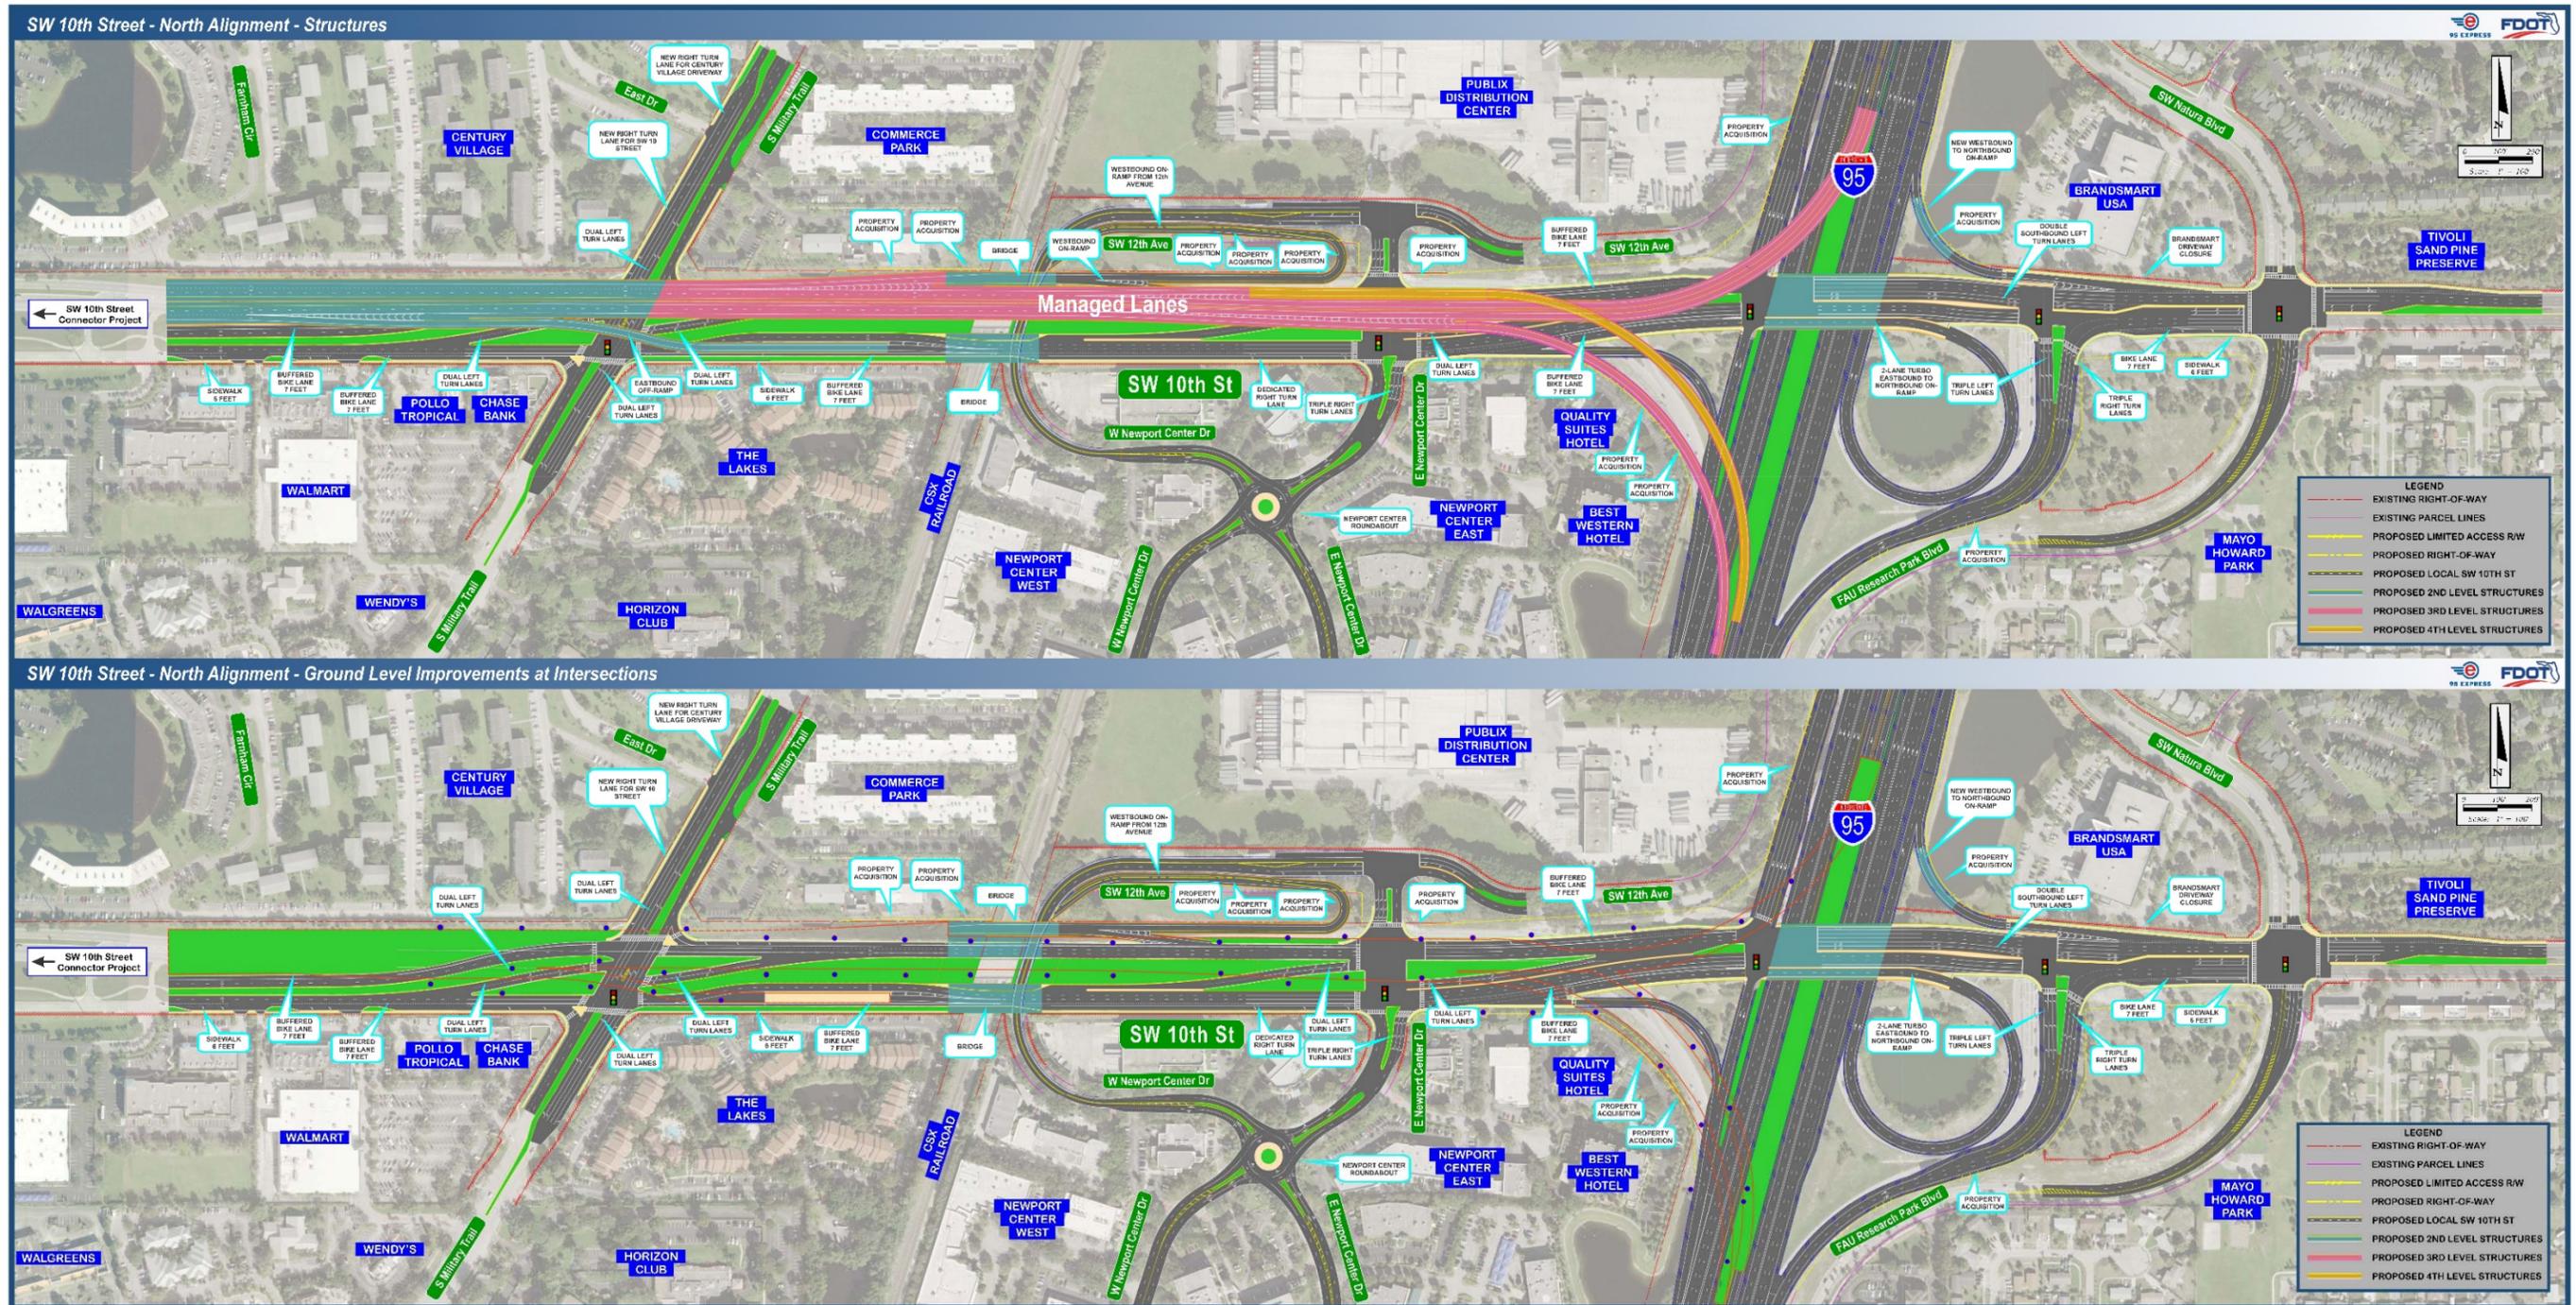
SW 10th Street – North Alignment Concept Plan
